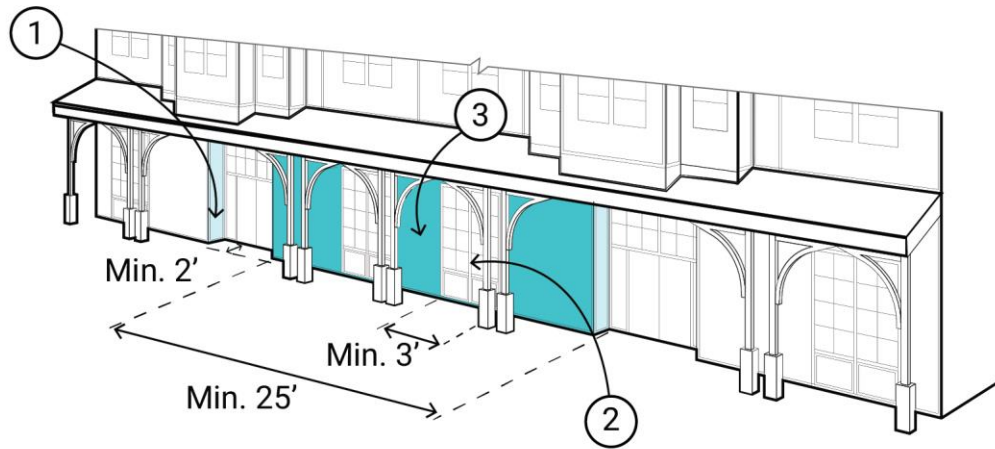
(B)(4)(b)(i): Façade requirements, certain streets — VMU District
